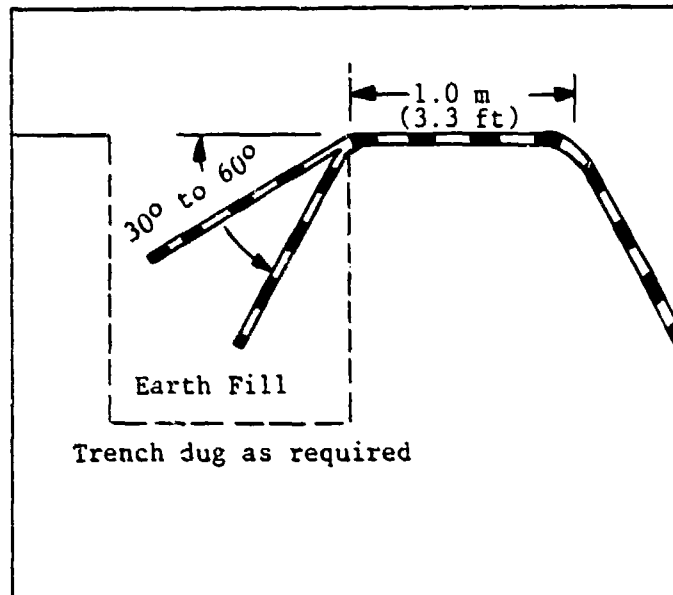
Typical Anchor Trench Design (Schlegel, 1977).
